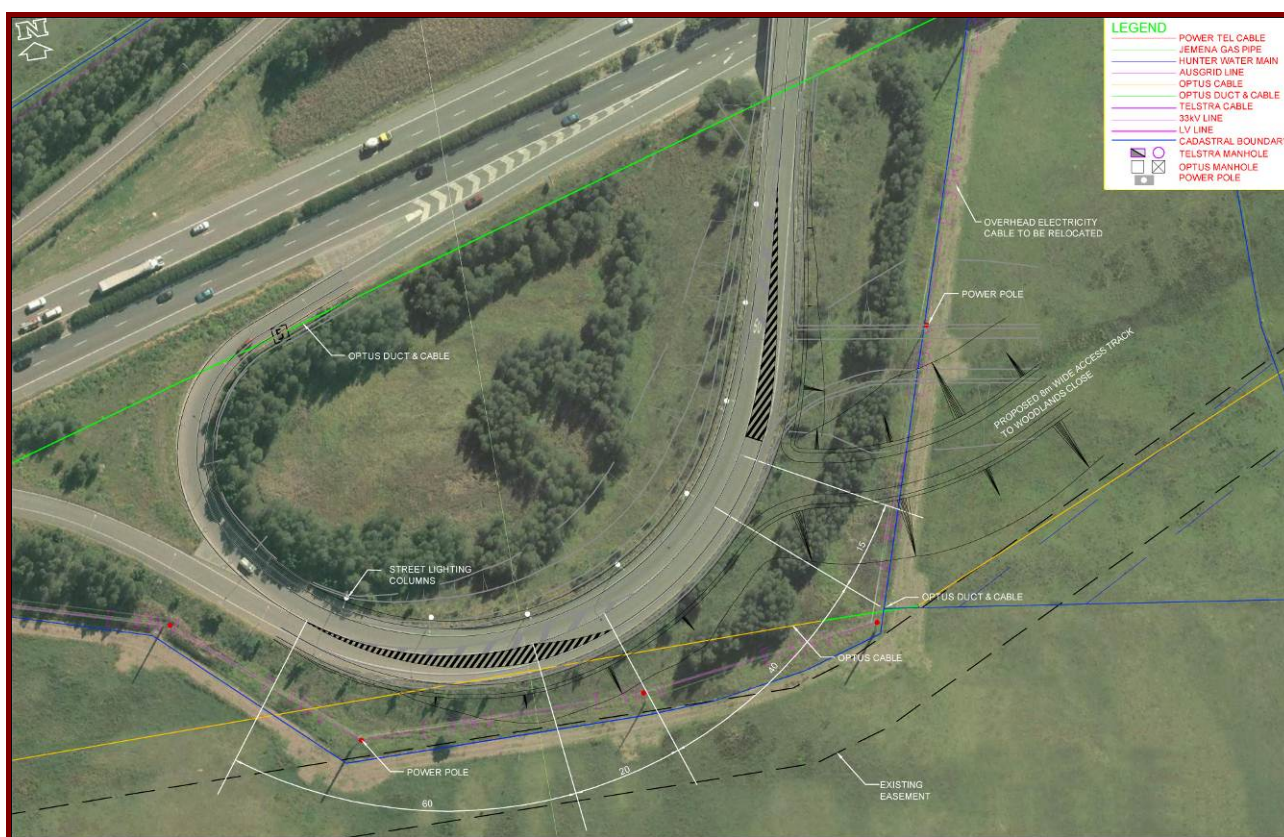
Proposed Intersection of Access Road with Tarro Interchange.
